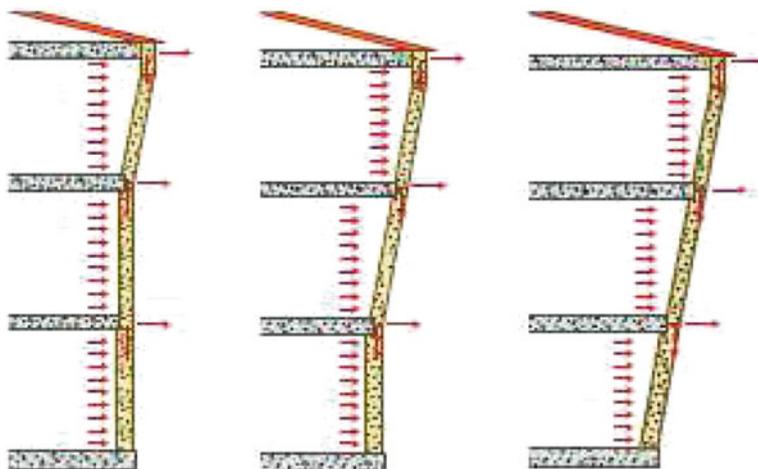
Out-of-plane failure of façade walls [17]
